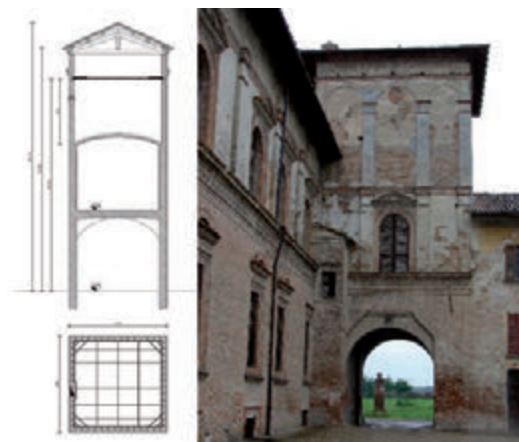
Above: vertical section of the tower; below: cross section and the structural interventions; right: the north tower.
